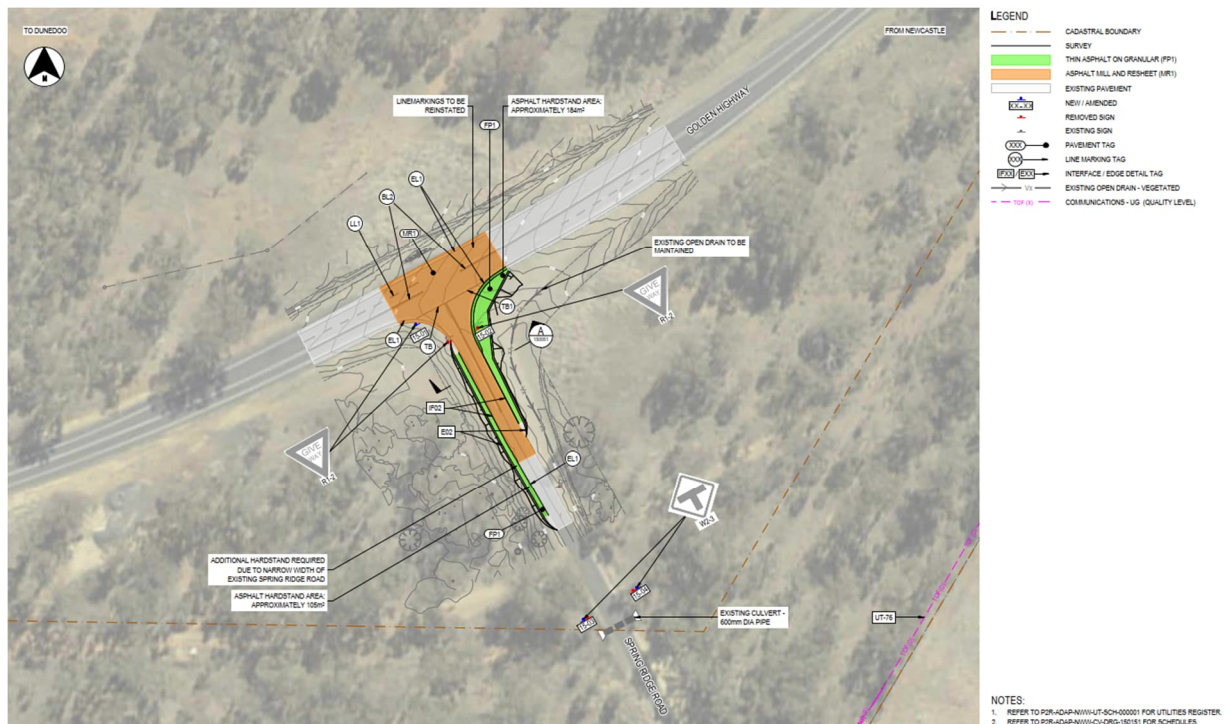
Detailed Design of the Golden Highway / Spring Ridge Road Intersection Modification
